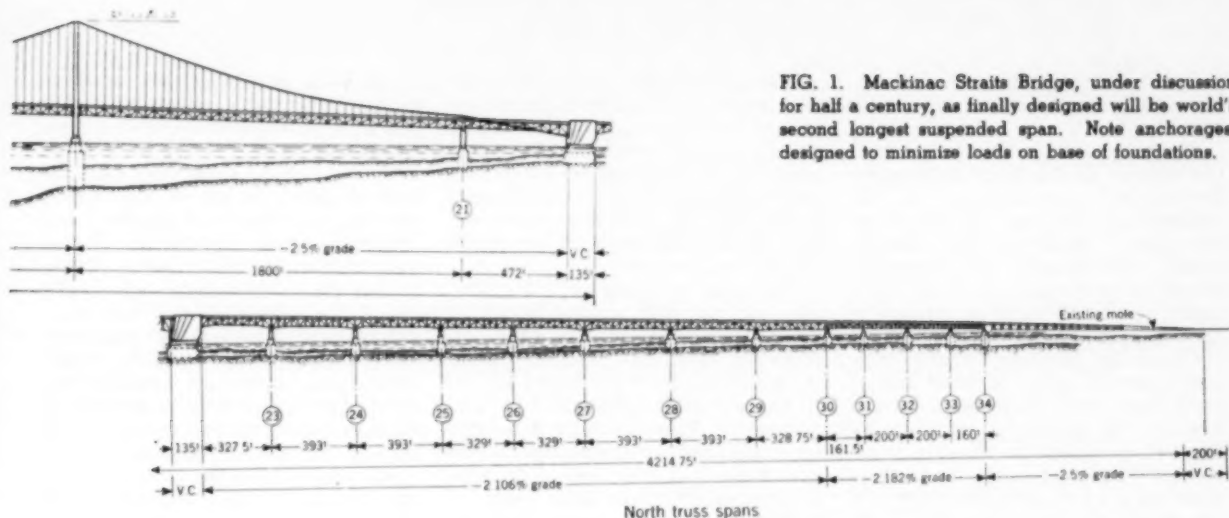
Mackinac Straits Bridge, under discussion for half a century, as finally designed will be world's second longest suspended span. Note anchorages, designed to minimize loads on base of foundations.
